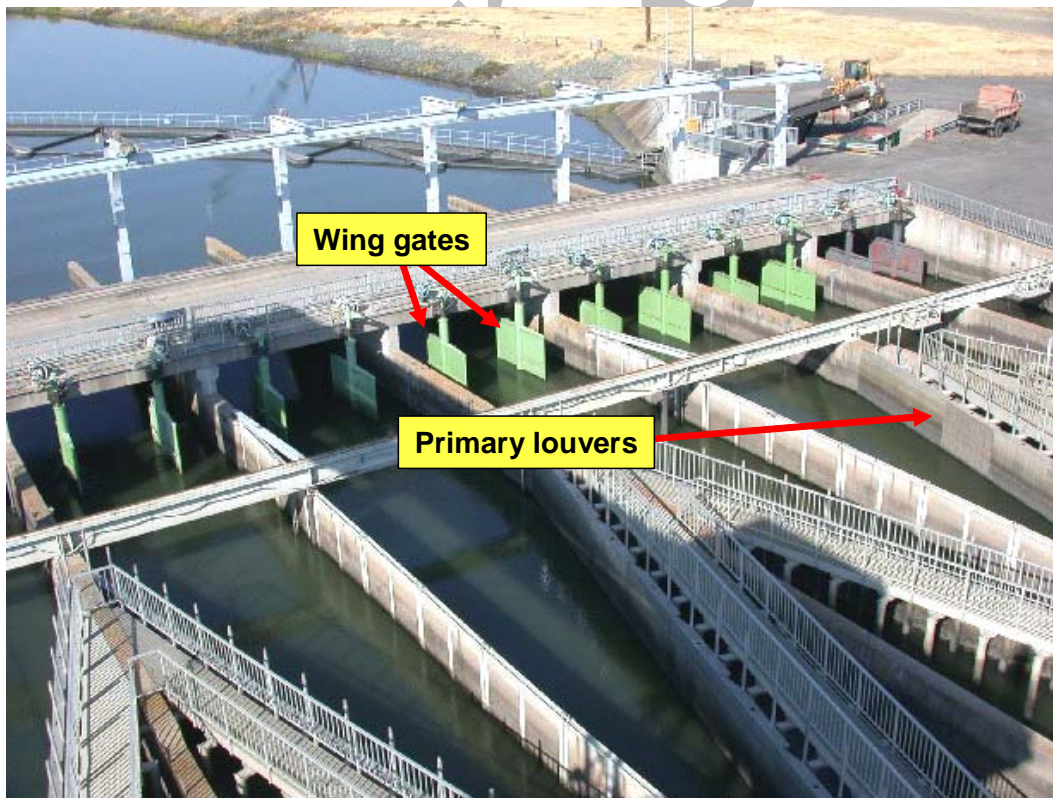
Overhead view of the primary louvers showing the location of the wing gates
